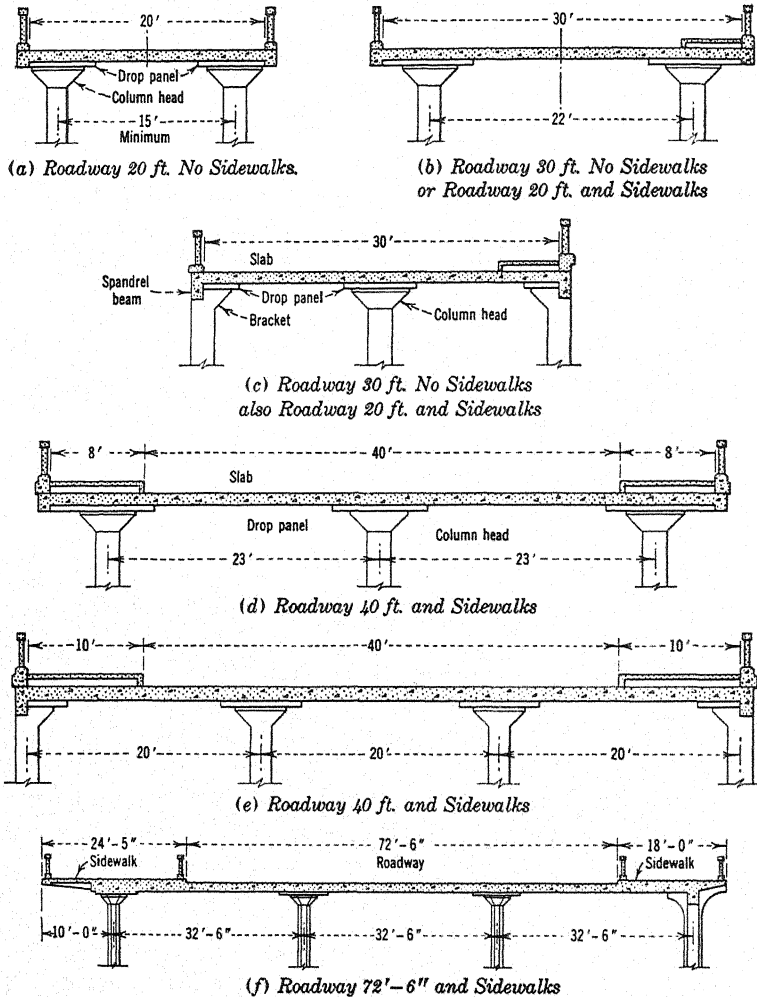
Typical Cross Sections of Flat-Slab Bridges. (See p. 327.)
